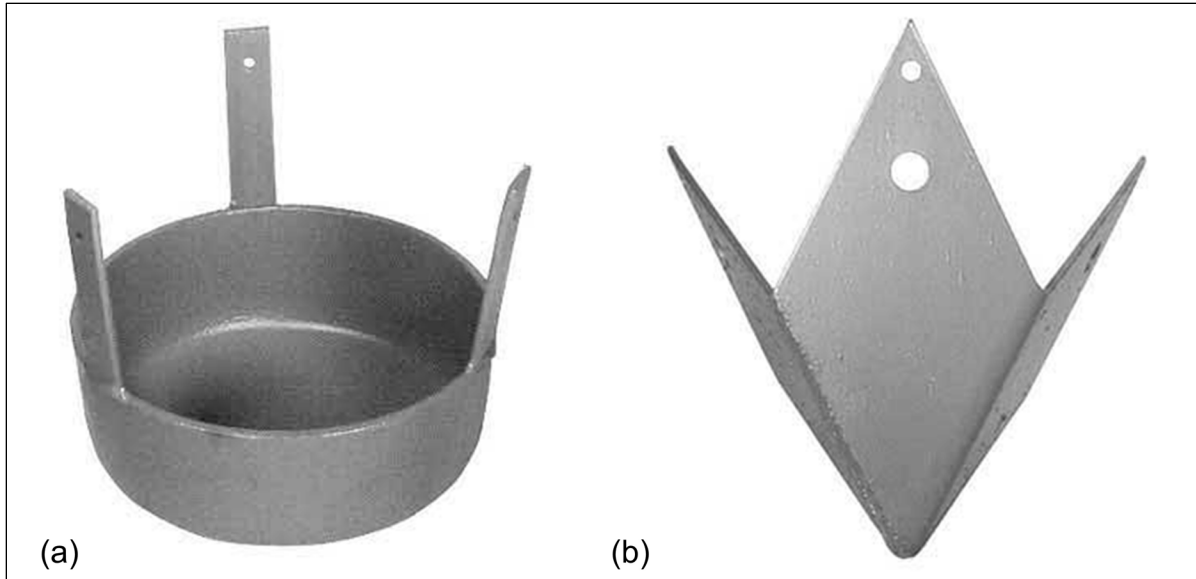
Timber pile toe attachments: (a) Pile boot and (b) Pile point (courtesy Skyline Steel).
